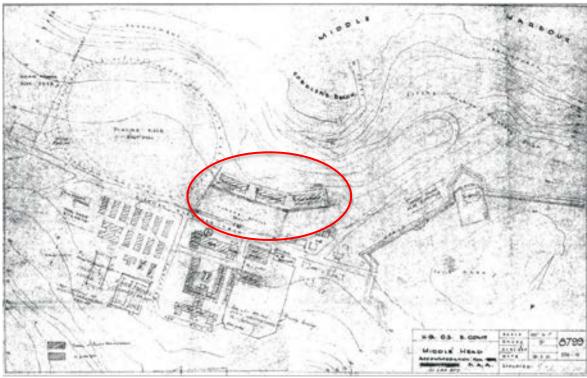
7: Site plan dated 18/5/1951 showing the three III LAA Battery barracks buildings and parade ground (circled). The laundry had not been constructed at this stage. The plan was annotated in 1957 indicating the new occupants of the buildings. Source: CMP 2007 Inventory Sheet for Building B1, Middle Head Accommodation III LAA Bty, 8799 HQ CE E Comd; NAA MP 927/1 A82/2/8
